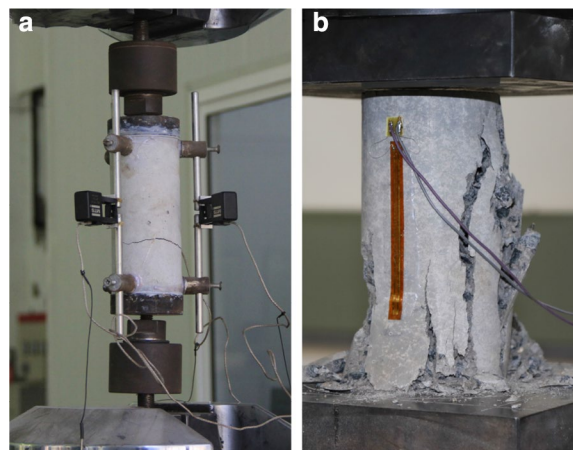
Typical failure patterns of the laboratory tests. a Typical failure pattern under tension, b typical failure pattern under compression.
